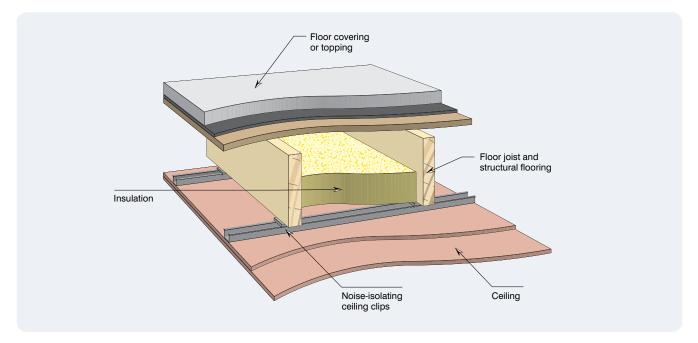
Illustration of components in a fire and acoustic rated timber-framed floor.
